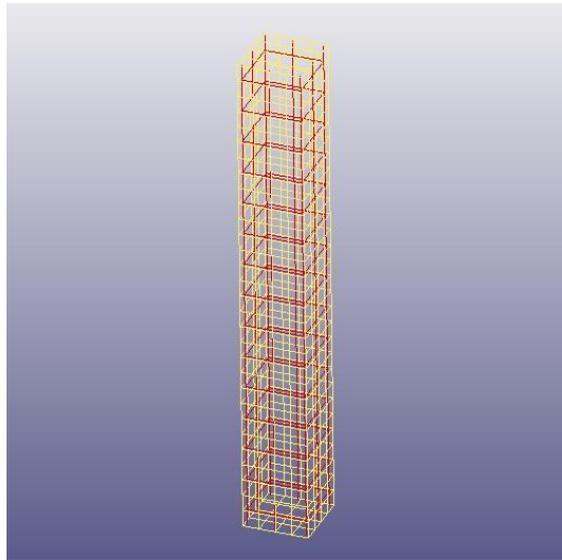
Finite element model of a reinforced concrete column generated in LS-PrePost.
